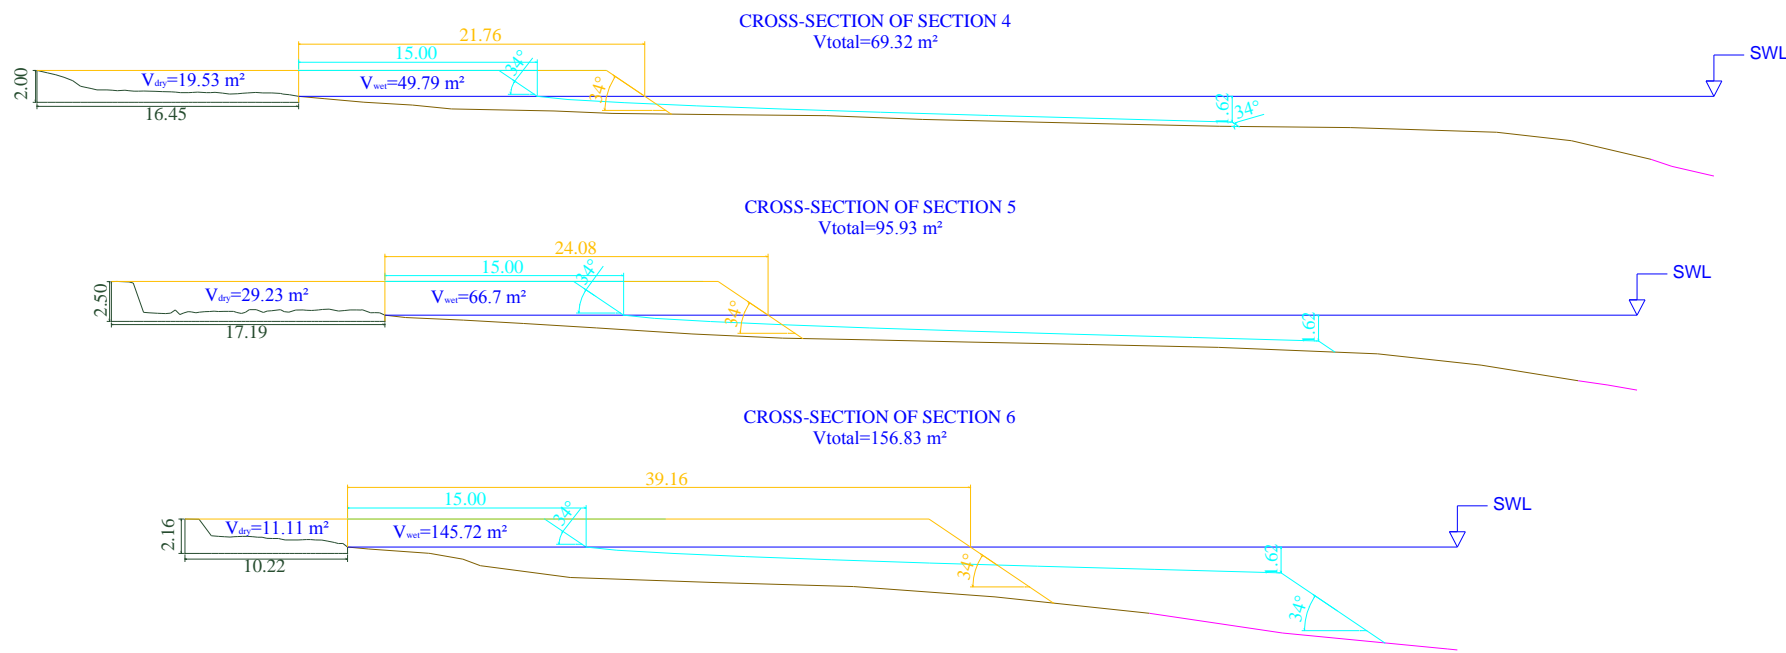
Design profiles of Section 4,5 and 6 for 15 m new dry beach width ($D_{fill}=0.32$ mm).
